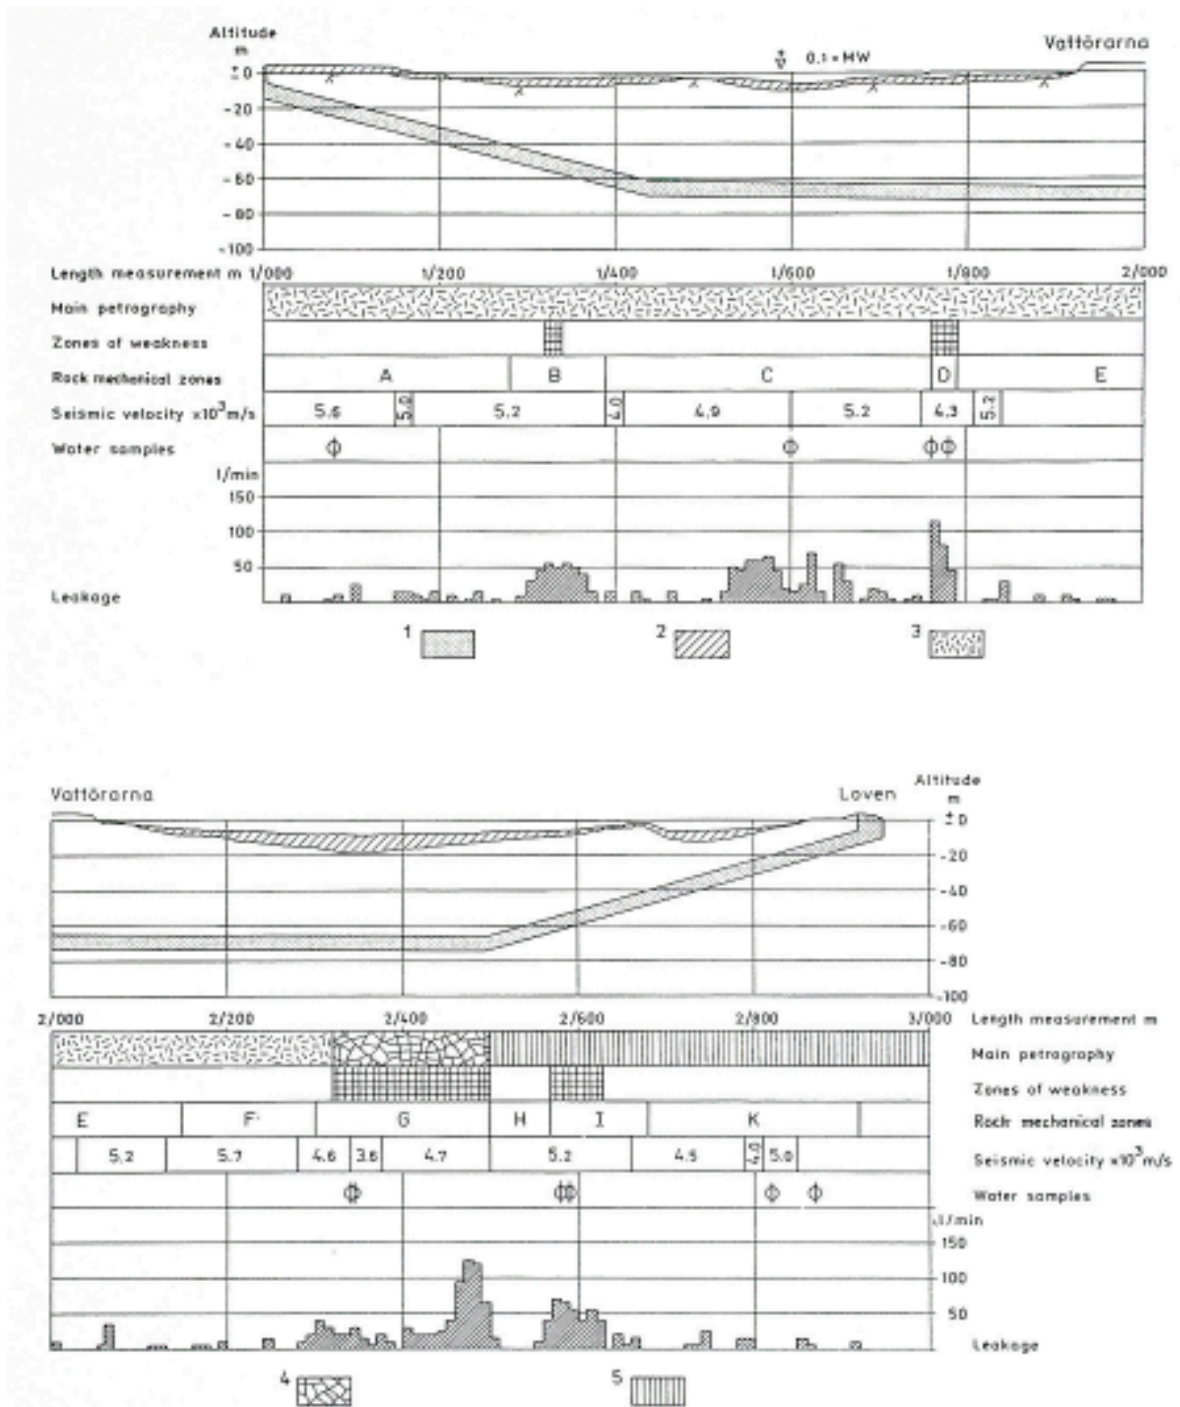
Longitudinal section through the Forsmark 1 and 2 tunnel, /Carlsson and Olsson 1977/.
